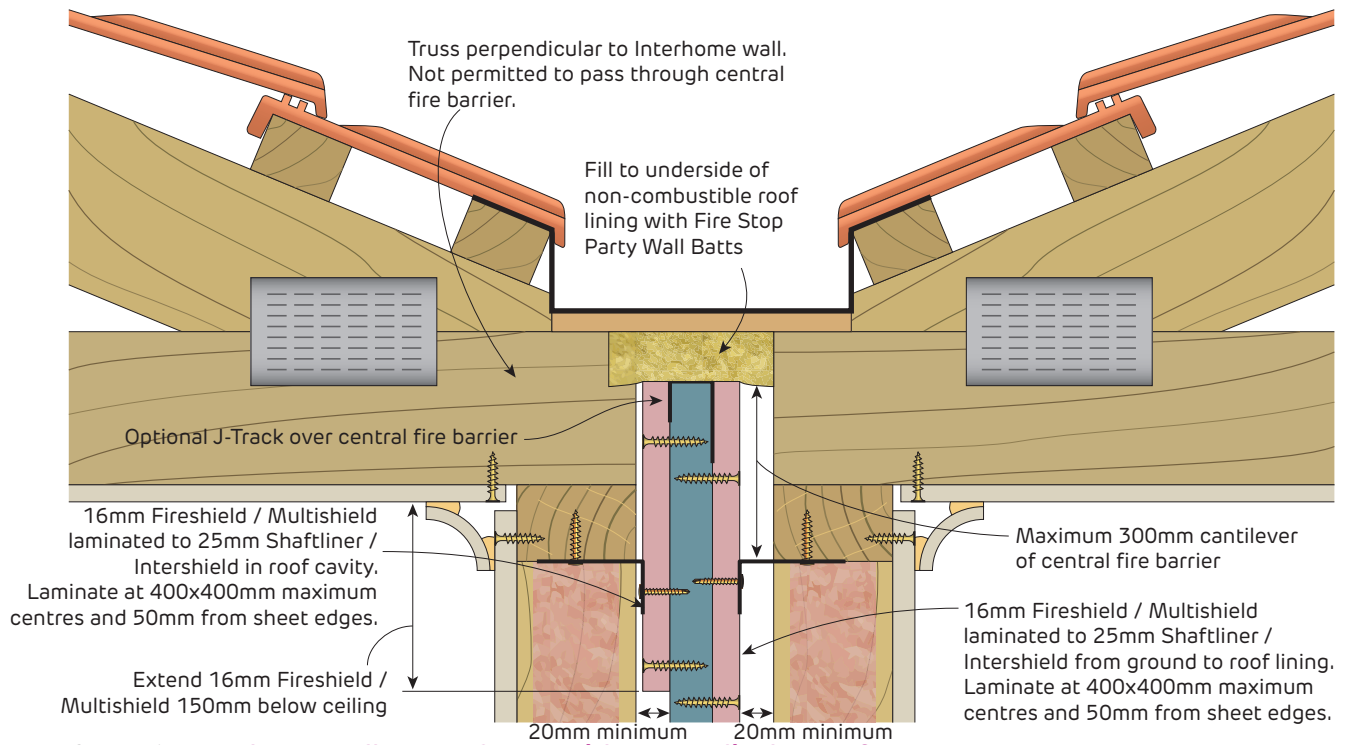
Interhome Wall to Box Gutter with Perpendicular Roof Trusses
